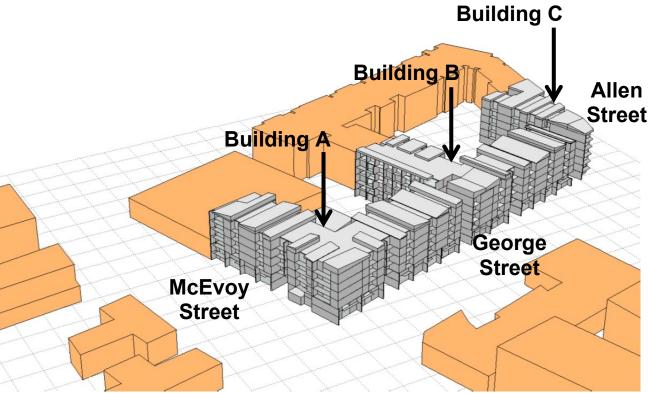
High angle perspective of 3D massing model showing proposed buildings A, B and C and the massing of existing surrounding development.
